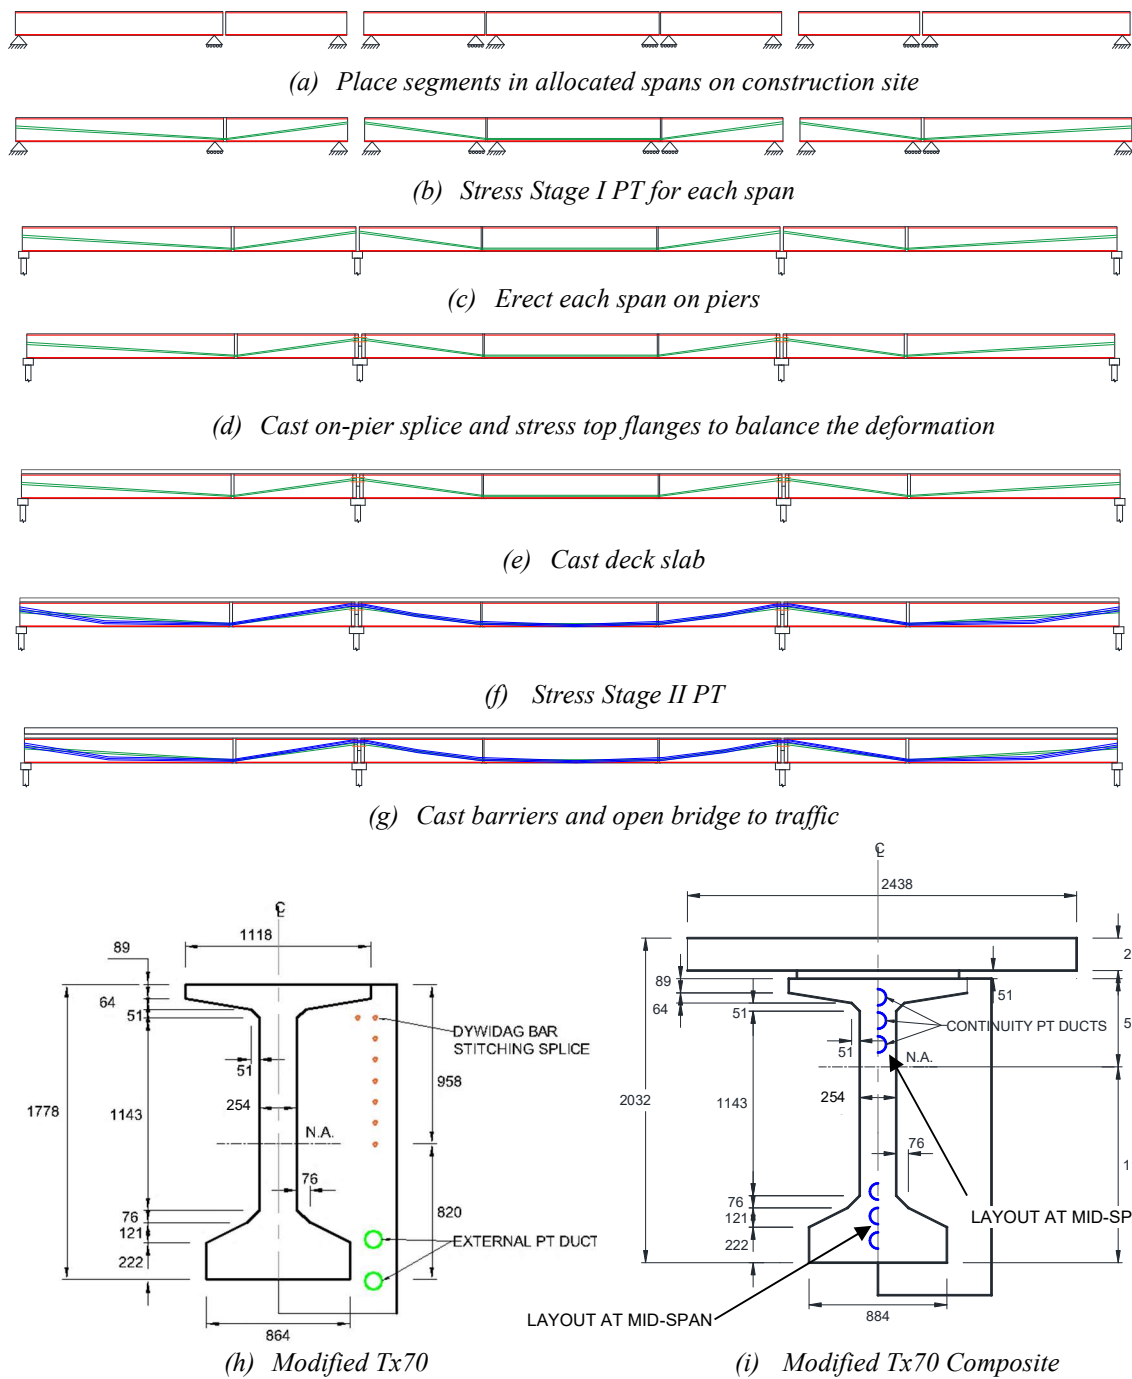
Sequence of construction without shore towers (heavy lift construction).
